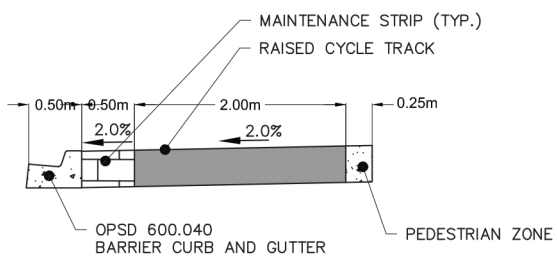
Sample Detail for Raised Cycle Track at Intersection
